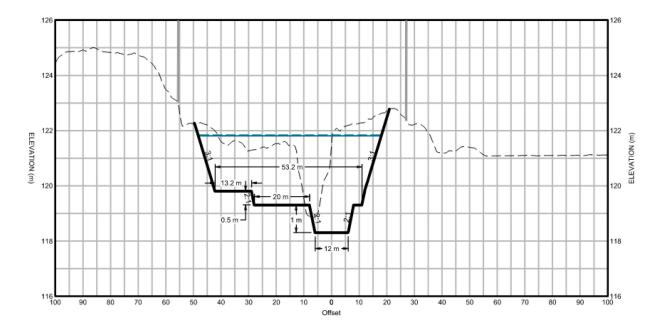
Preferred Design Creek Cross-section - 200 m Downstream of Dixie Road
